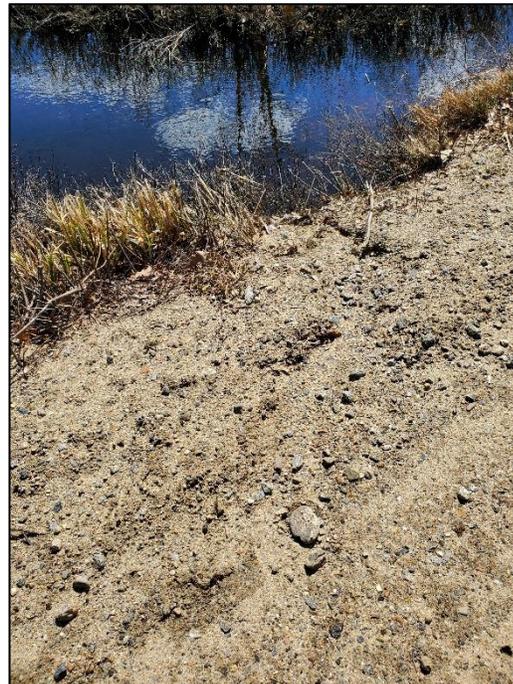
View of downstream side of Sawmill Shores Road culvert, view looking north.
